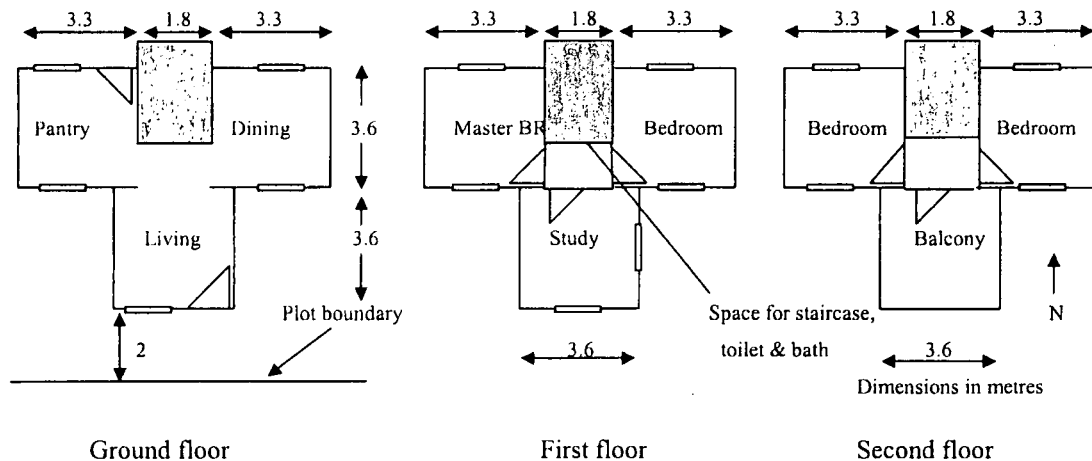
Ground floor, first floor and second floor plans of the modeled house
